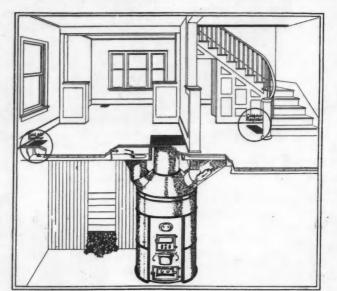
A Pipeless Heater Installation Employing Separate Return Air Ducts to Prevent Floor Draft.
